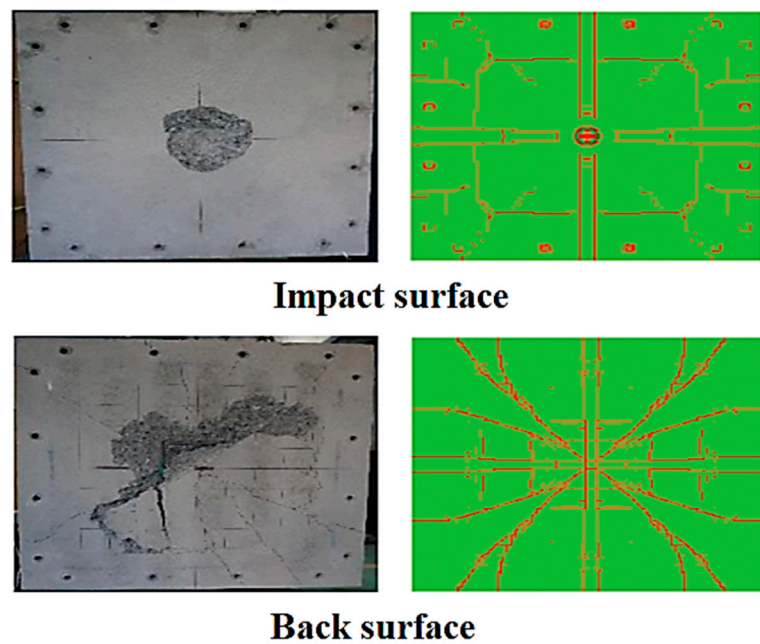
Under impact load, RC slab failure behavior [51].
